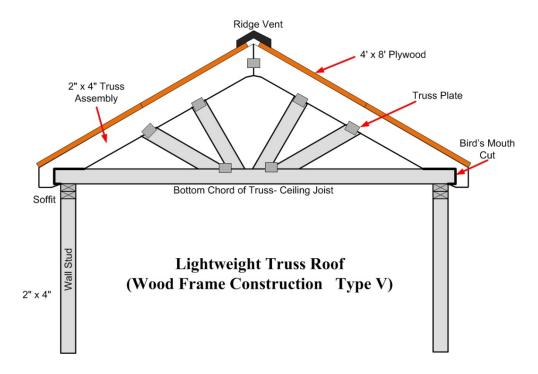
An Attic is the Void Space between the Ceiling and the Gable Roof
